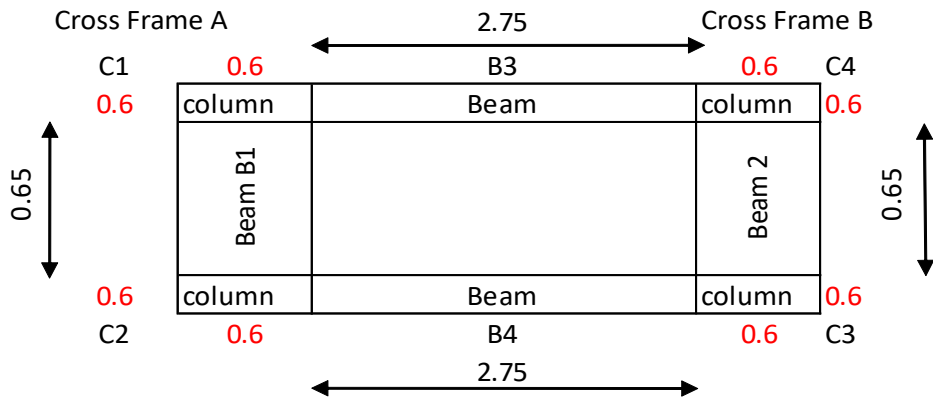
Column and Beam frame arrangement at top level (i.e. Plan at top level).
